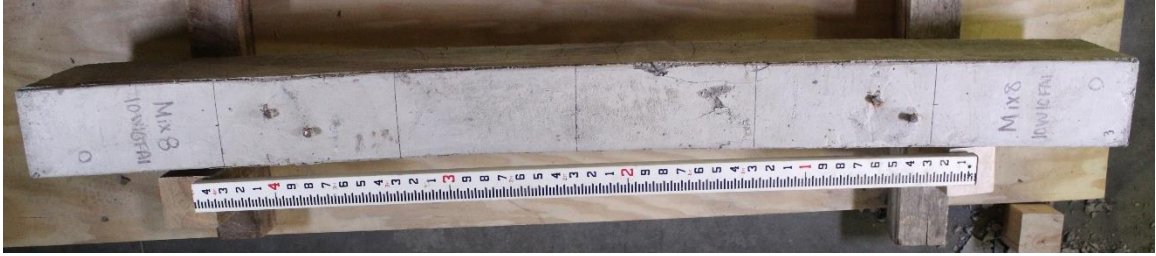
Mixture 8 (10W10FA1) beam #30: concrete beam top view.
